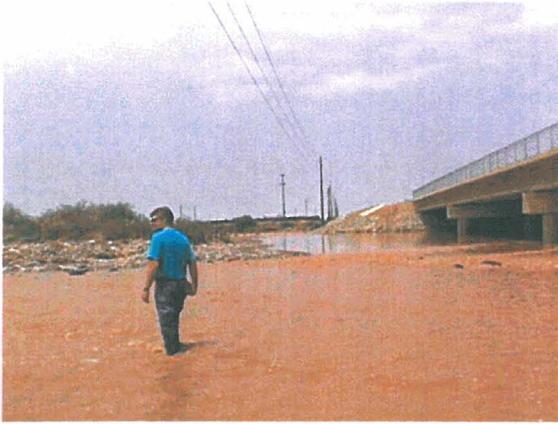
Backwater area downstream of Carefree Highway bridge caused by excavation of channel bed in bridge section. Note diversion of flow to west into right floodplain. Photo looking west on July 15, 1999.
